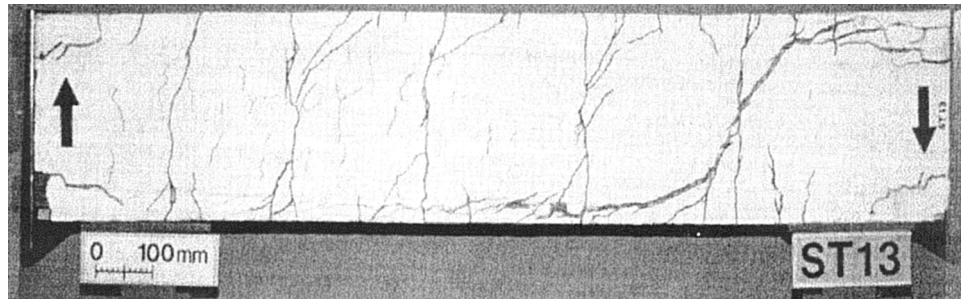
Typical crack pattern without transverse reinforcement subjected to axial tension and shear (Adebar and Collins 1996).
